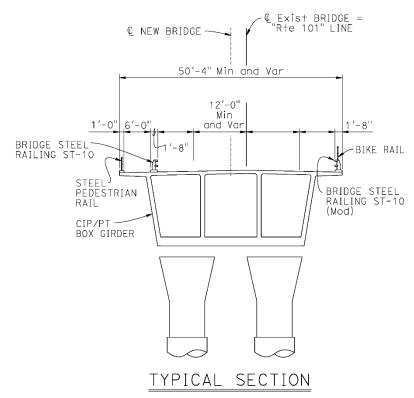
Cross Section of Proposed Cast-In-Place Bridge Looking North, Pedestrian Walkway on Left
